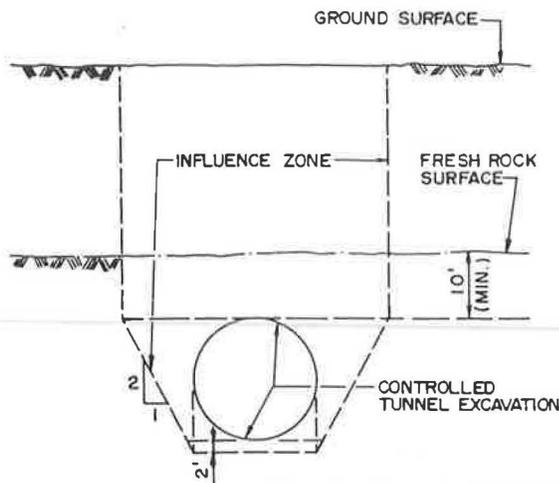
Underpinning guidelines for tunnel construction in rock.
